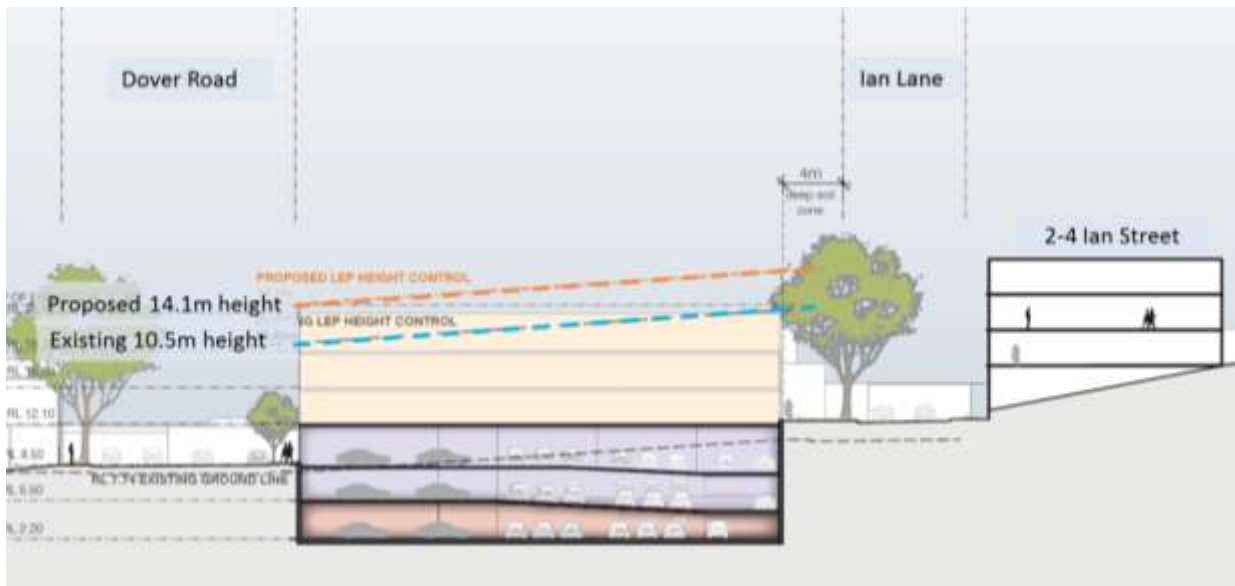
Section between Dover Road and Ian Lane showing the existing and proposed maximum building heights, concept for the site and surrounding existing buildings
